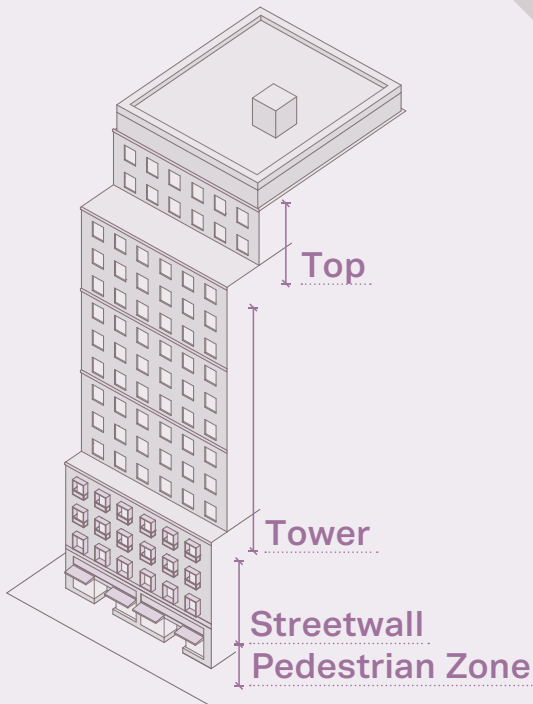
Building massing should be organized into four zones: Pedestrian Level, Streetwall, Tower, and Top.
